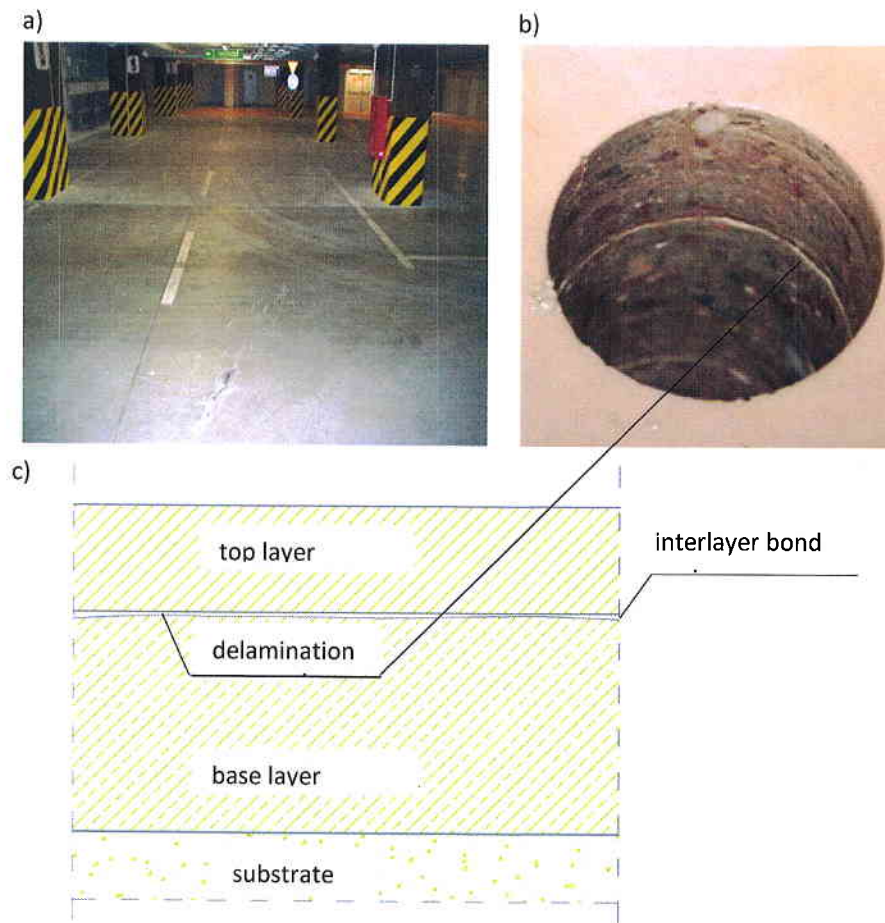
Illustration of material imperfection – delamination at interface between concrete layers: a) view of floor in indoor underground car park, b) test pit in car park floor, c) schematic of delamination.
